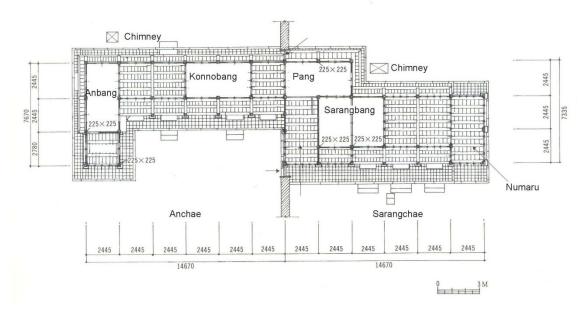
Anchae, Sarangchae Floor Plan (N. Zu 2003)
